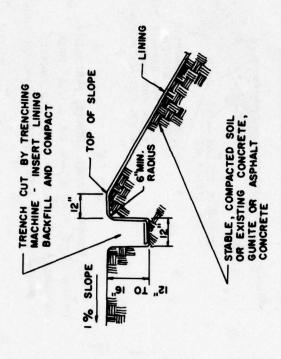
Top anchor detail--alternative 4, all linings except asphalt panels (Kays, 1977). Courtesy of John Wiley & Sons, Inc., New York, N.Y.
